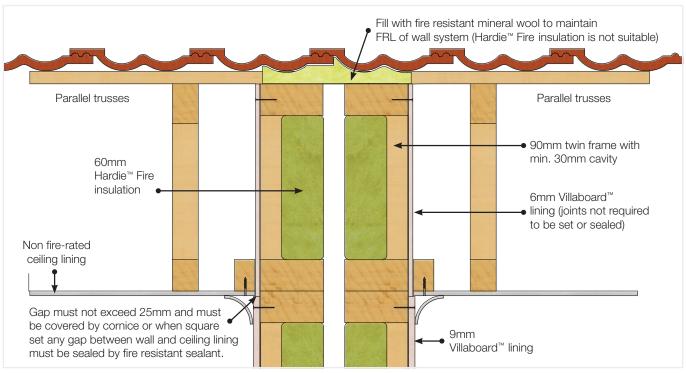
HARDIE™ SMART INTERTENANCY WALL SYSTEM WITH PARALLEL ROOF TRUSSES
